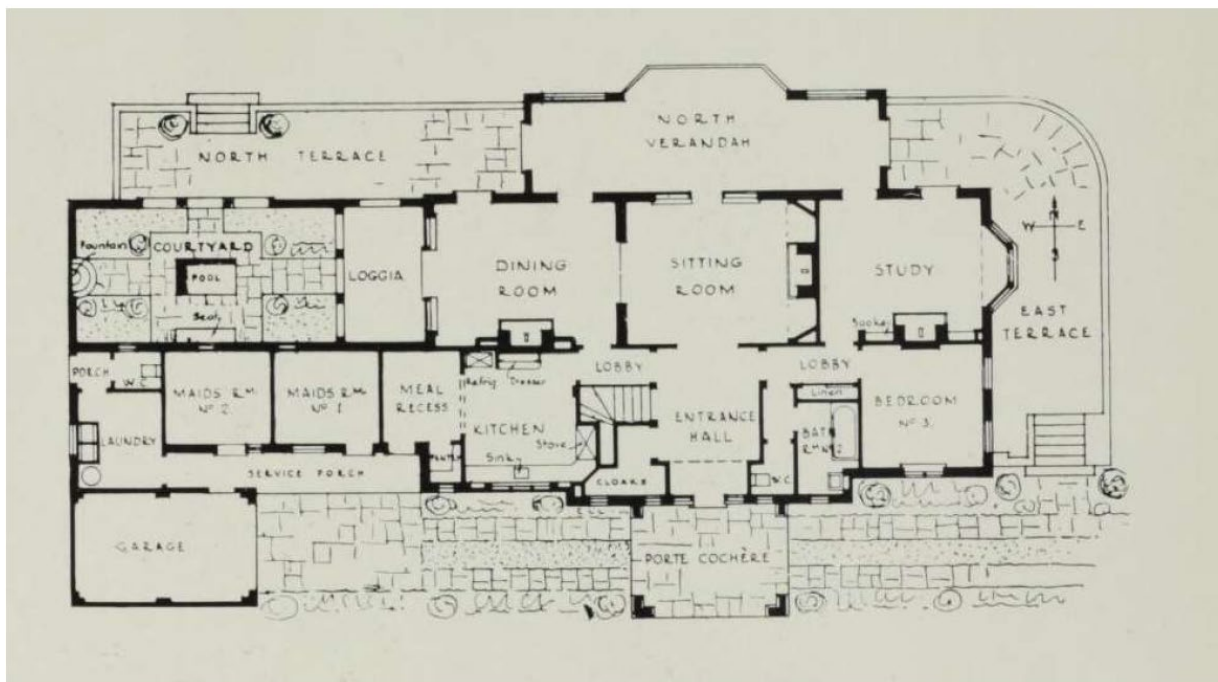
The original published floor plan. Source Decoration and Glass 1 March 1936.
